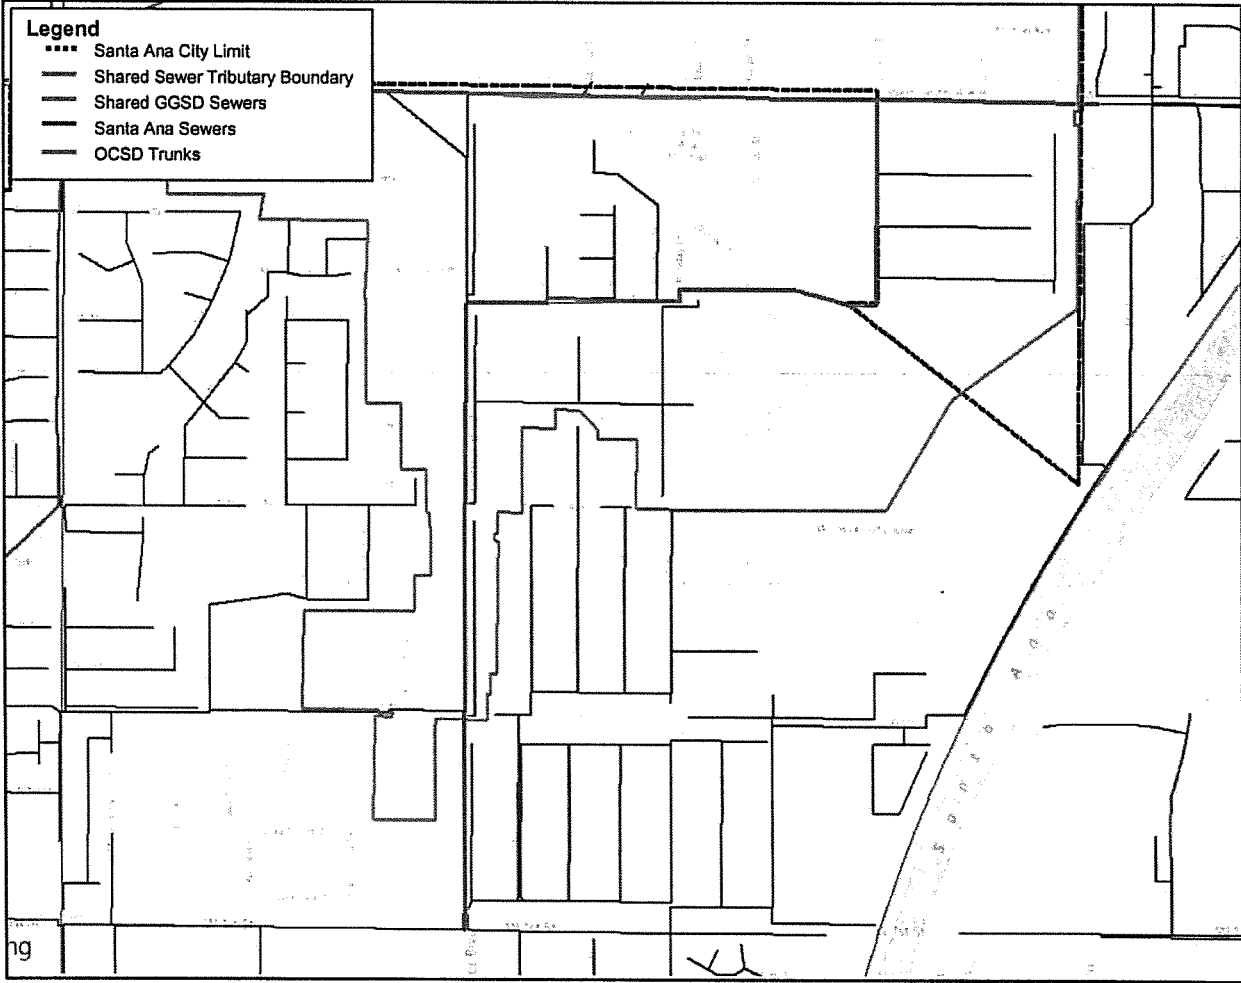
Detail - City of Santa Ana and Garden Grove Sanitation District Shared Sewer System
